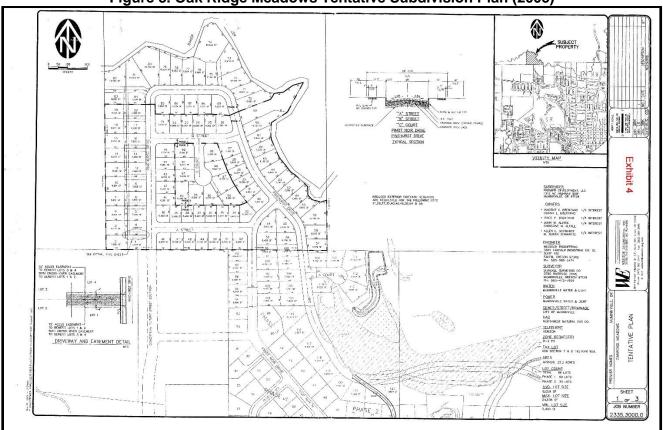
Oak Ridge Meadows Tentative Subdivision Plan (2005)
